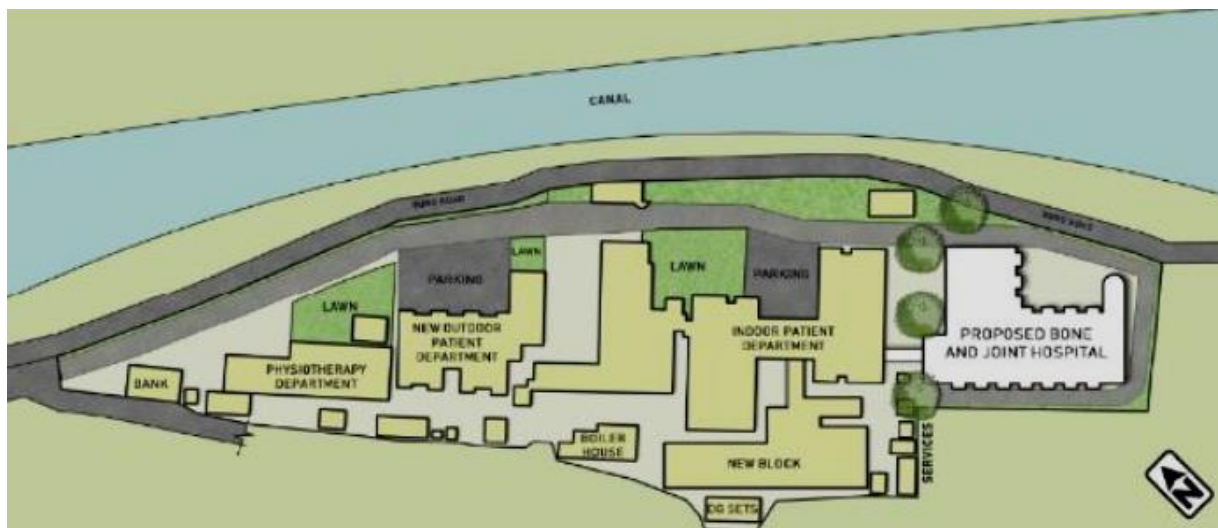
Layout plan of proposed building and Bone & Joint Hospital, Barzulla (kashmir)
